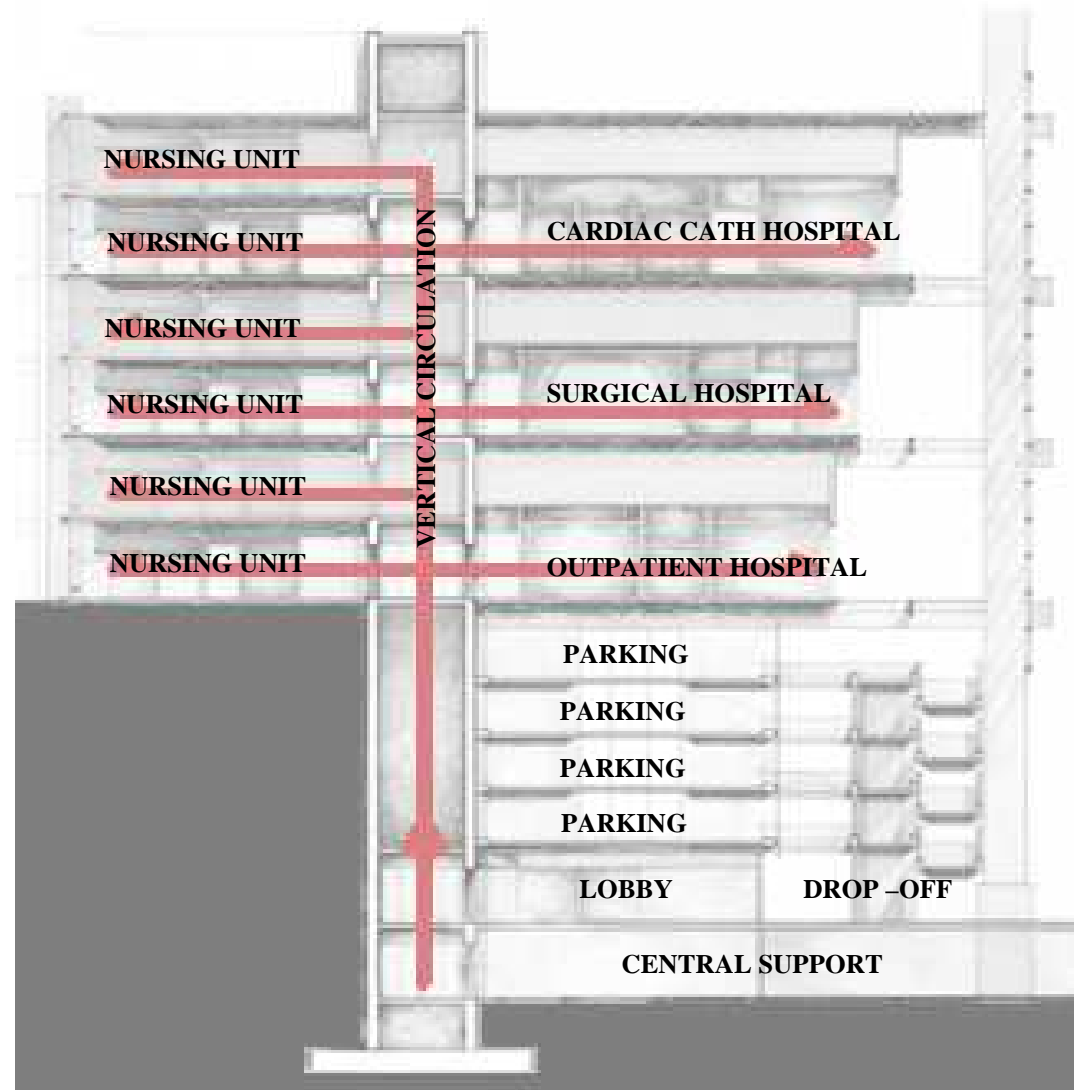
Building Cross-Section showing vertically stratified hospital services.
